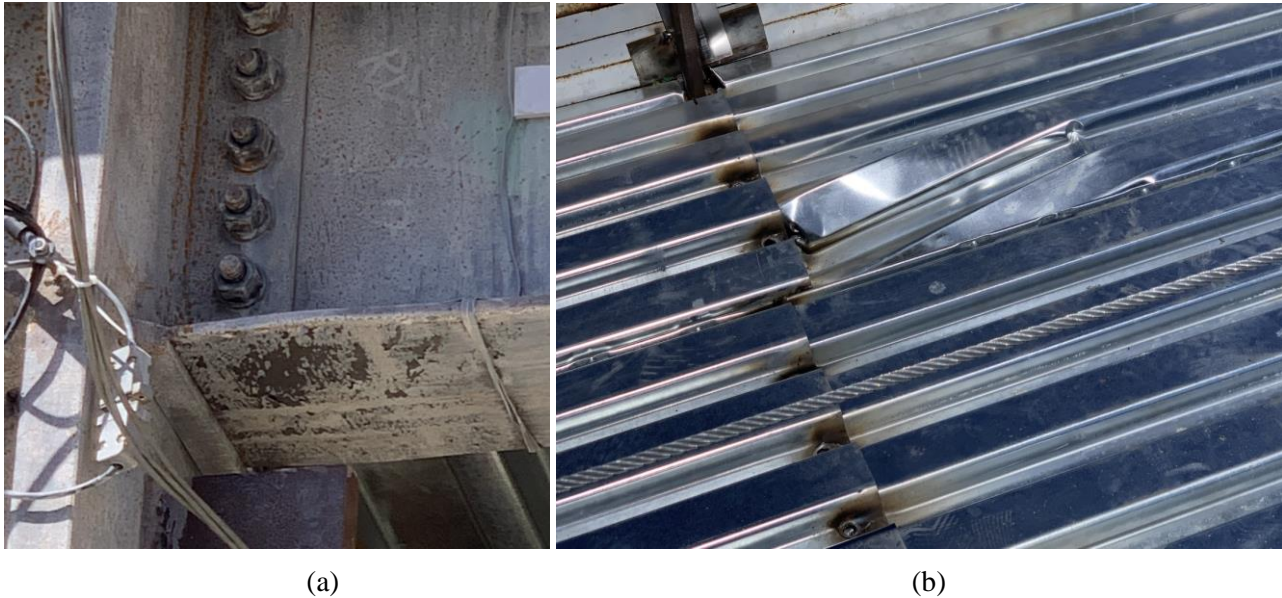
Shake Table Test Specimen Damage: (a) Local Buckling of AFW Connection Bottom Flange; (b) Longitudinal Seam Failure of Roof Deck.
